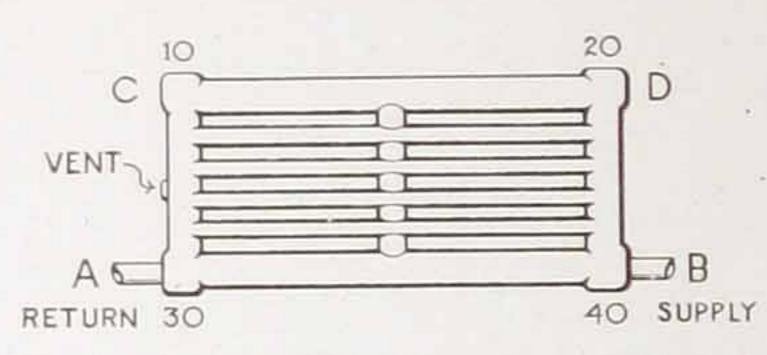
One and Two-Pipe Steam - Regular Horizontal Assembly
